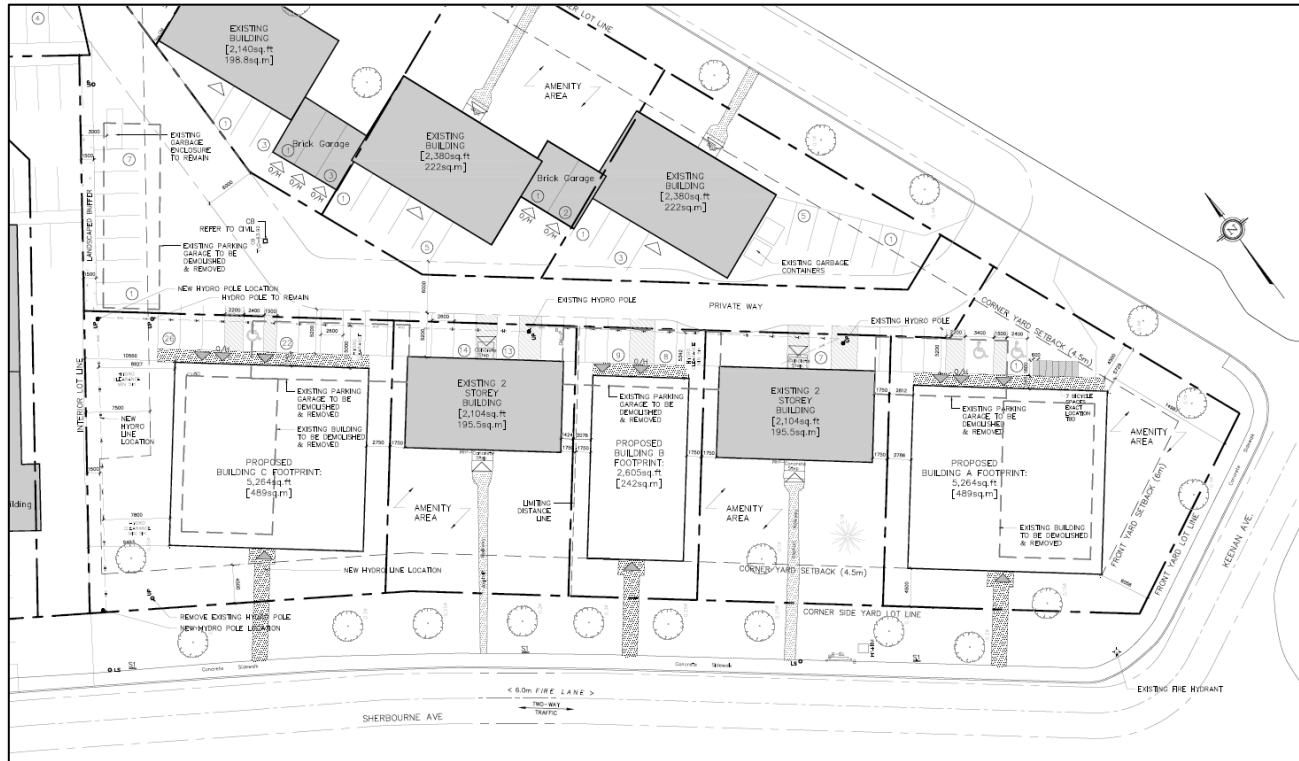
Partial Site Plan (S.J. Lawrence Architect)
